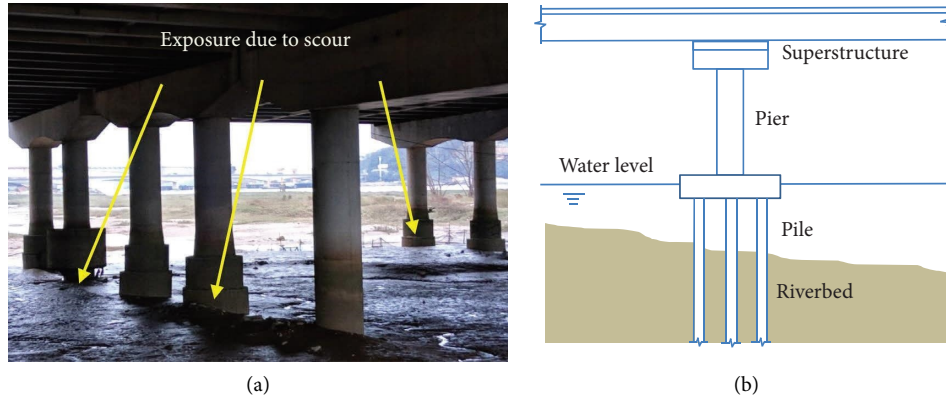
Actual photo and sketch of exposed piles. (a) Partial exposed piles caused by scour. (b) Elevated pile-cap foundation.
